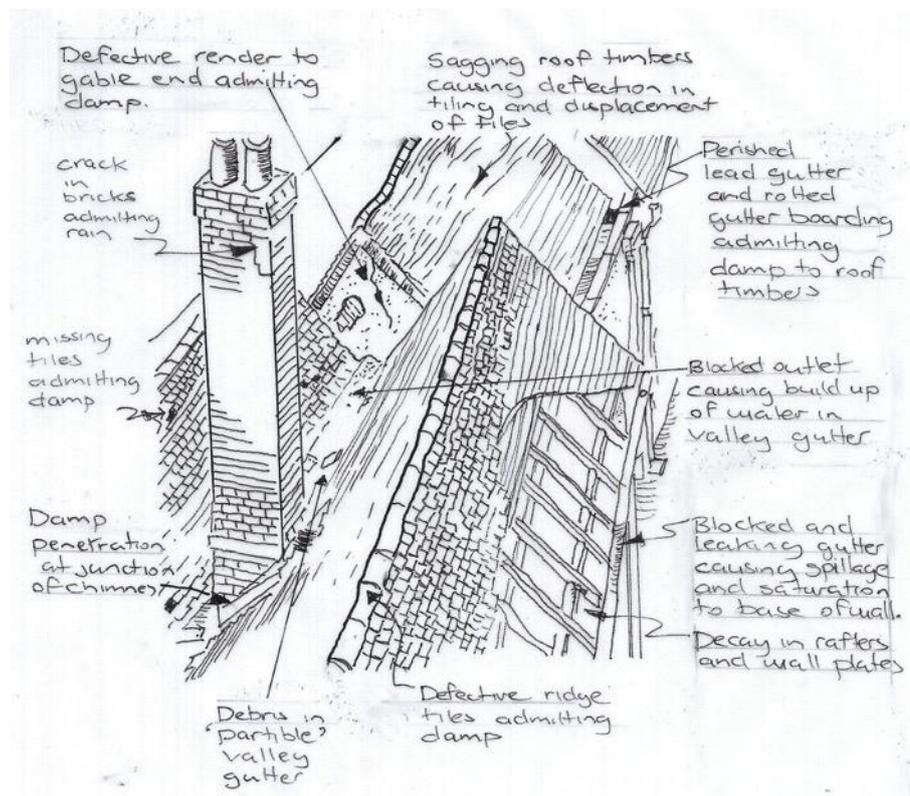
Annotated sketch giving simple explanation of defects at roof level typically in pre-Fire buildings, adapted from Watt and Swallow, *Surveying Historic Buildings*, p.88.
